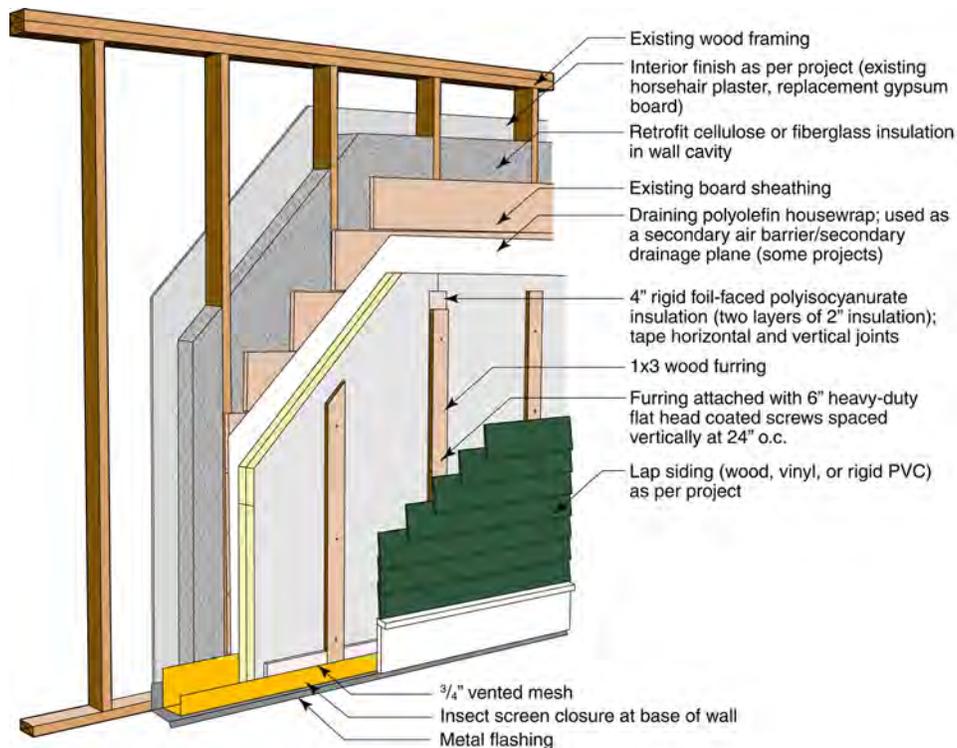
Isometric view of wall retrofit assembly, showing assembly components.
